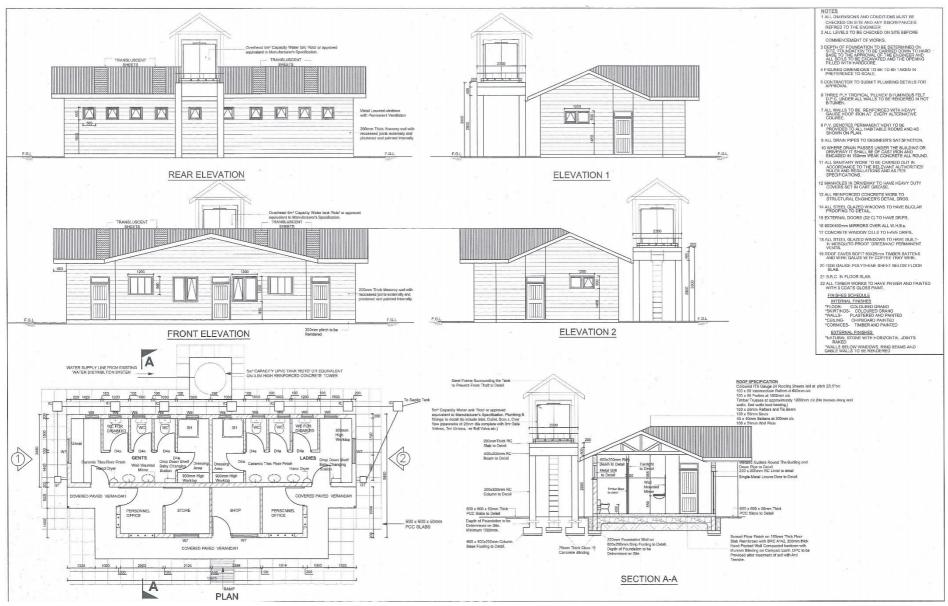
Typical Plan, Views and Sections of an Ablution Block
